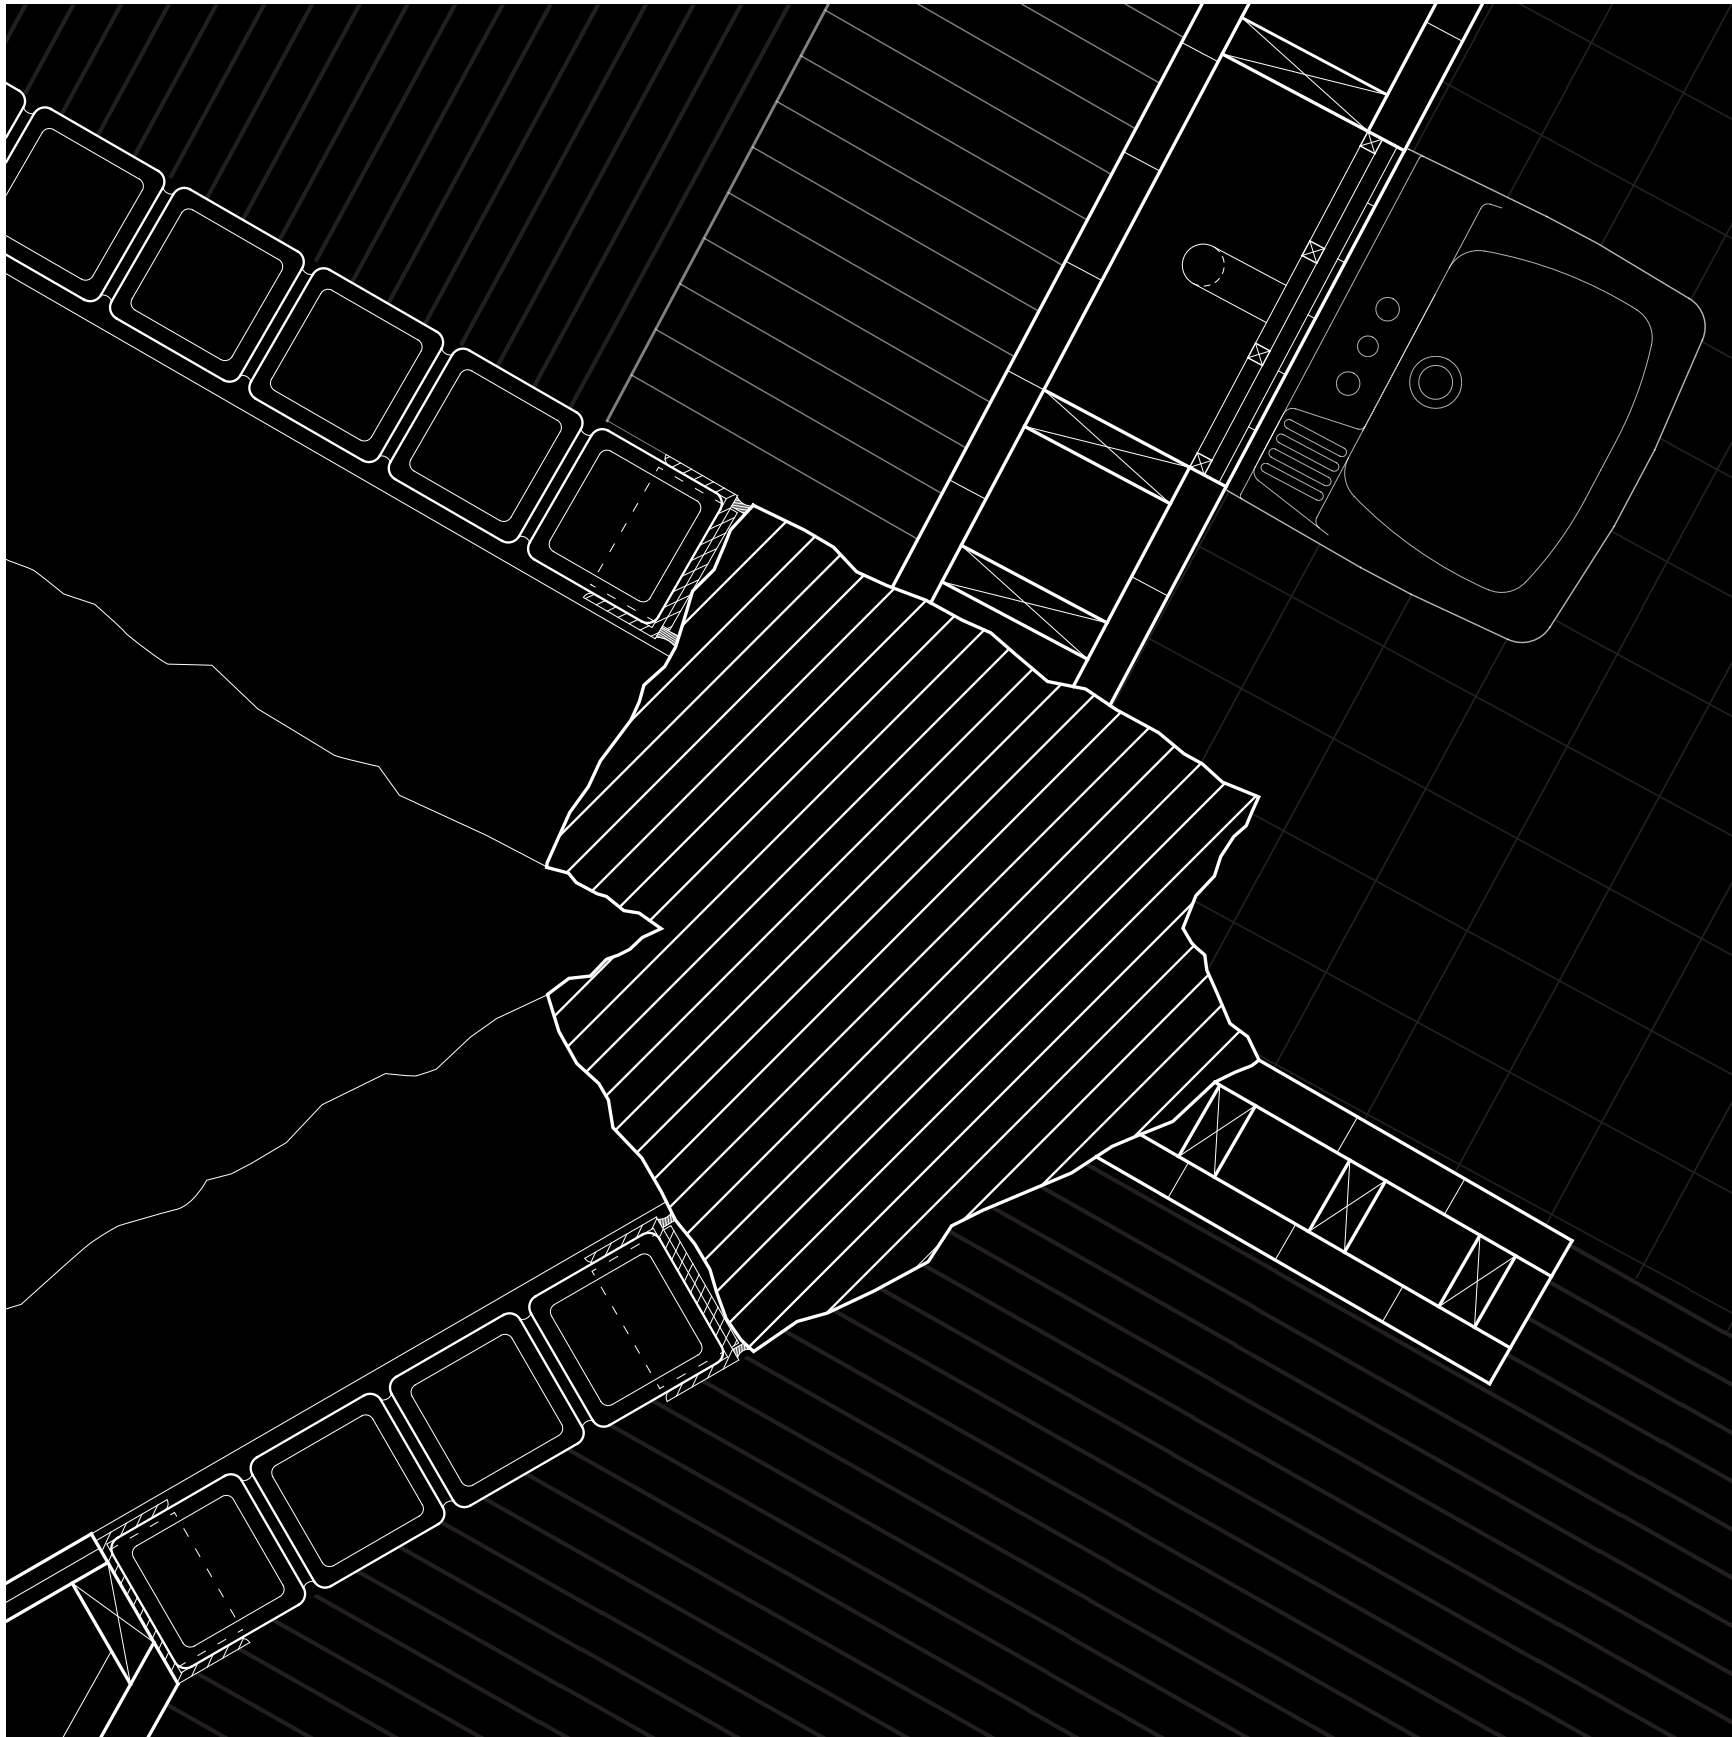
Detail Drawing Highlighting The Durable Stone Column and the Flexible Surrounding Walls.
